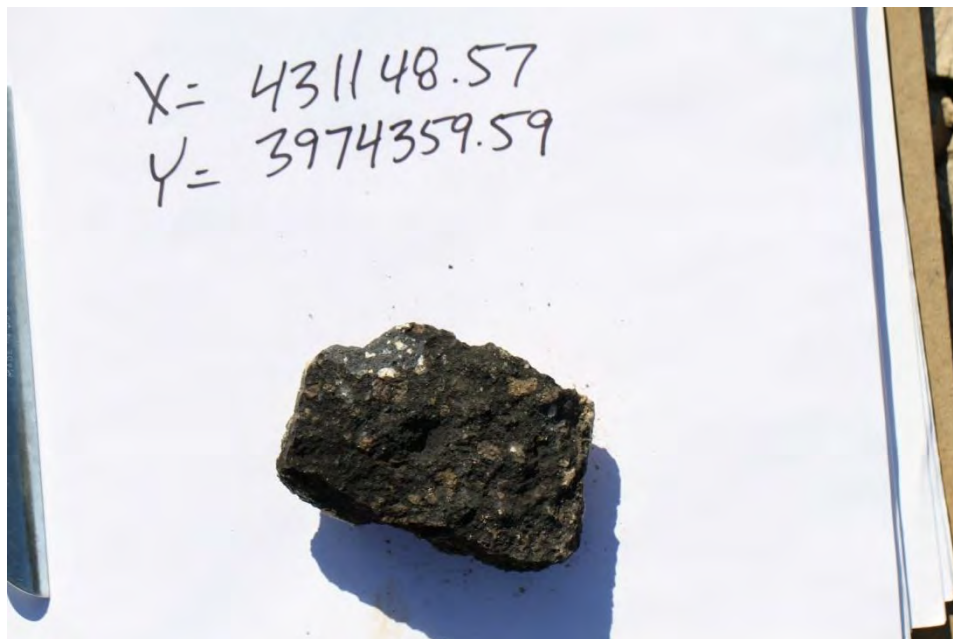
Roof Fragment Weighing 210.5 g Found 89.5 m Northeast From the Center of the Structure (Test 4).
